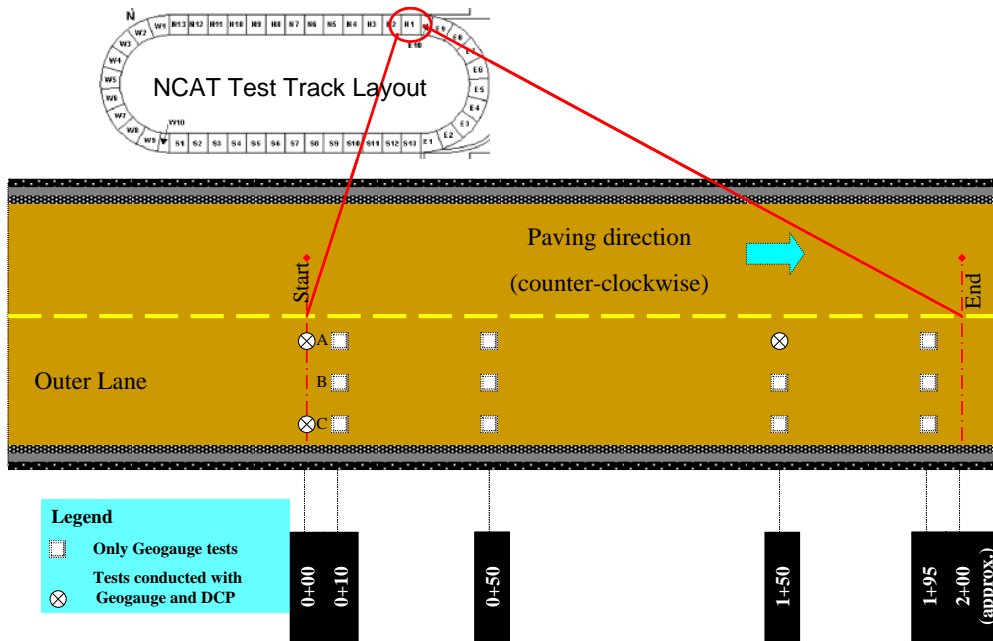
Layout of Test Points Along the Florida DOT Limerock Base Placed in Section N-2 at the NCAT Test Track (refer to Tables B.14 and B.15)
